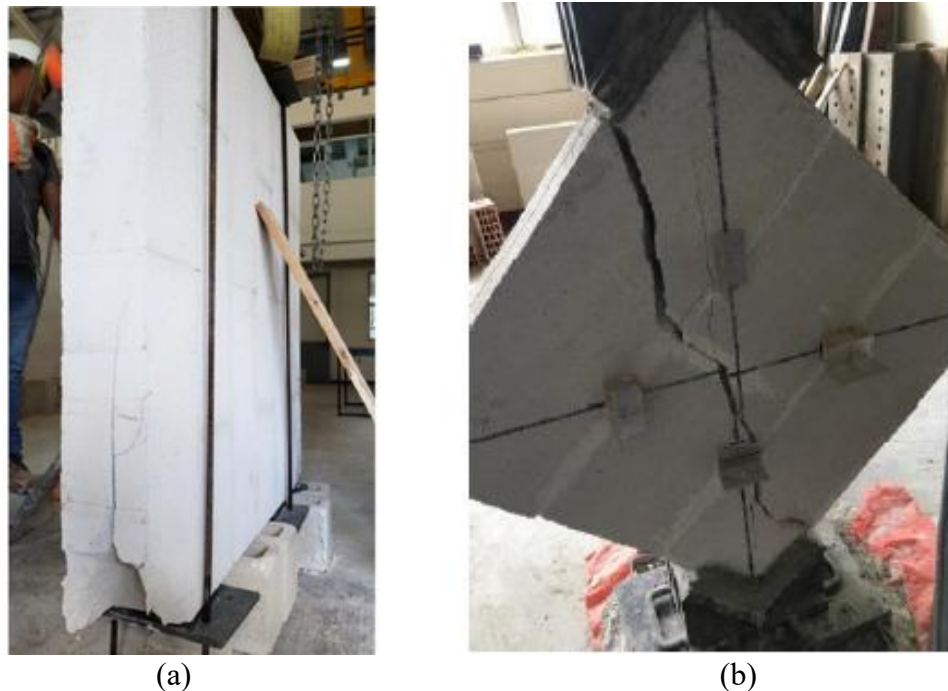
Failure of AAC masonry wallets. (a) 120 cm × 120 cm wallet; (b) 60 cm x 60 cm wallet.
